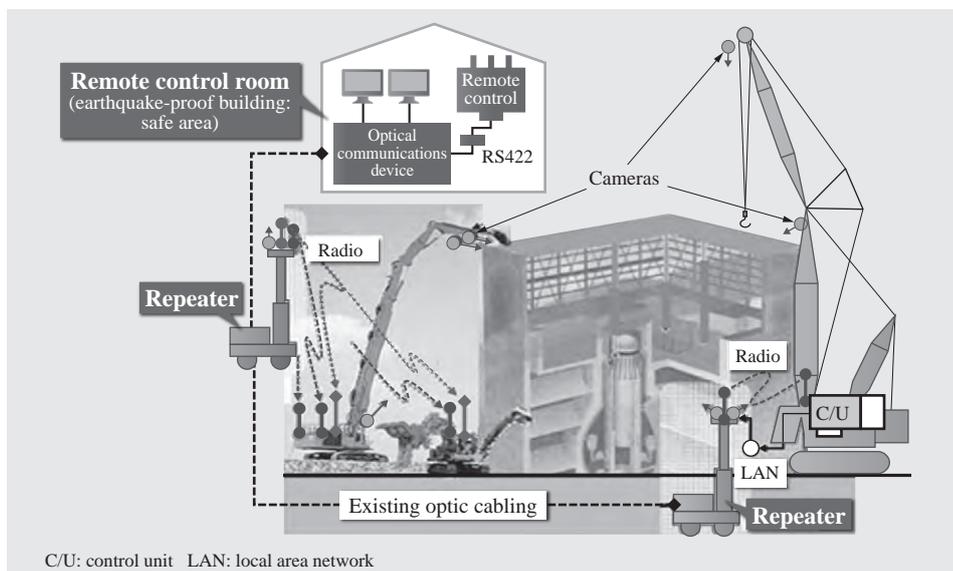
Proposed Remote Control System for Large Machinery. Hitachi Construction Machinery was quick to propose a remote control system using equipment such as demolition machines and large cranes to the relevant authorities, and started work on preparing the machinery and radio control system.
